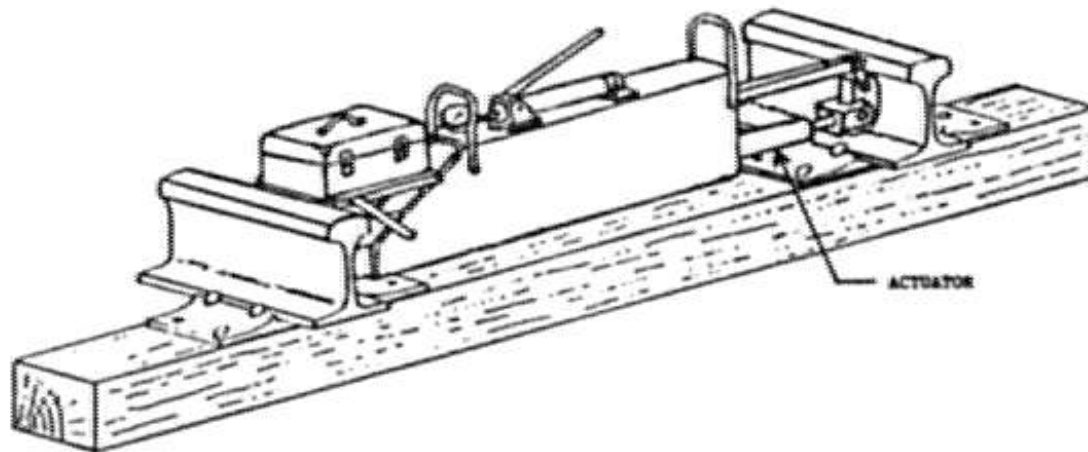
LIGHTWEIGHT TRACK LOADING FIXTURE
